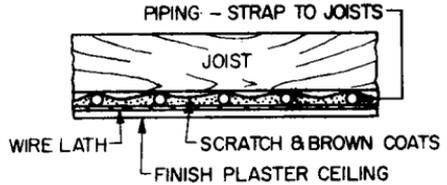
Pipe coil embedded above lath and plaster ceiling for radiant heating.
